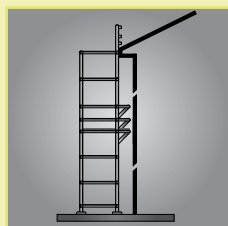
(e) Inside standards supporting guardrailing with hop-up bracket for other trades.
